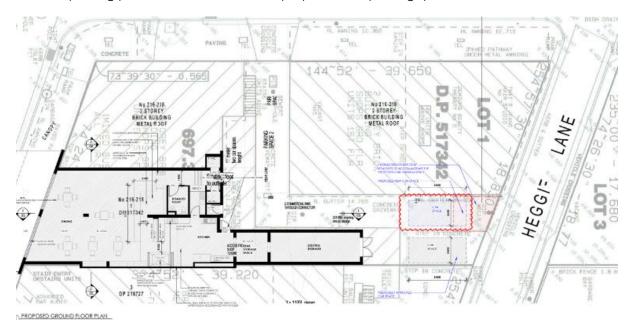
Extract of approved internal layout (Source: Premium Design and Engineering, 2022).
